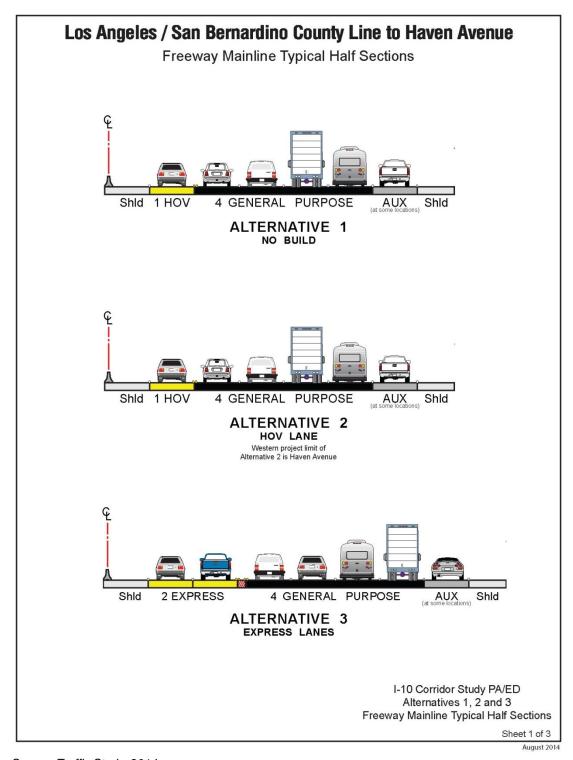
Alternatives 1, 2, and 3 Typical Half Sections (Page 1 of 3)
